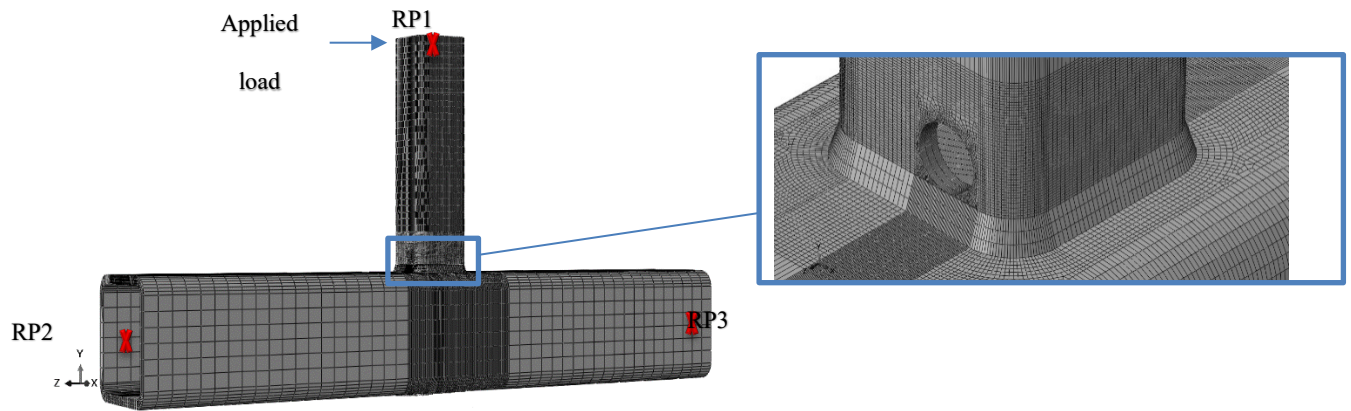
Typical FE RHS-to-RHS T-connection geometry, mesh layout and load application
